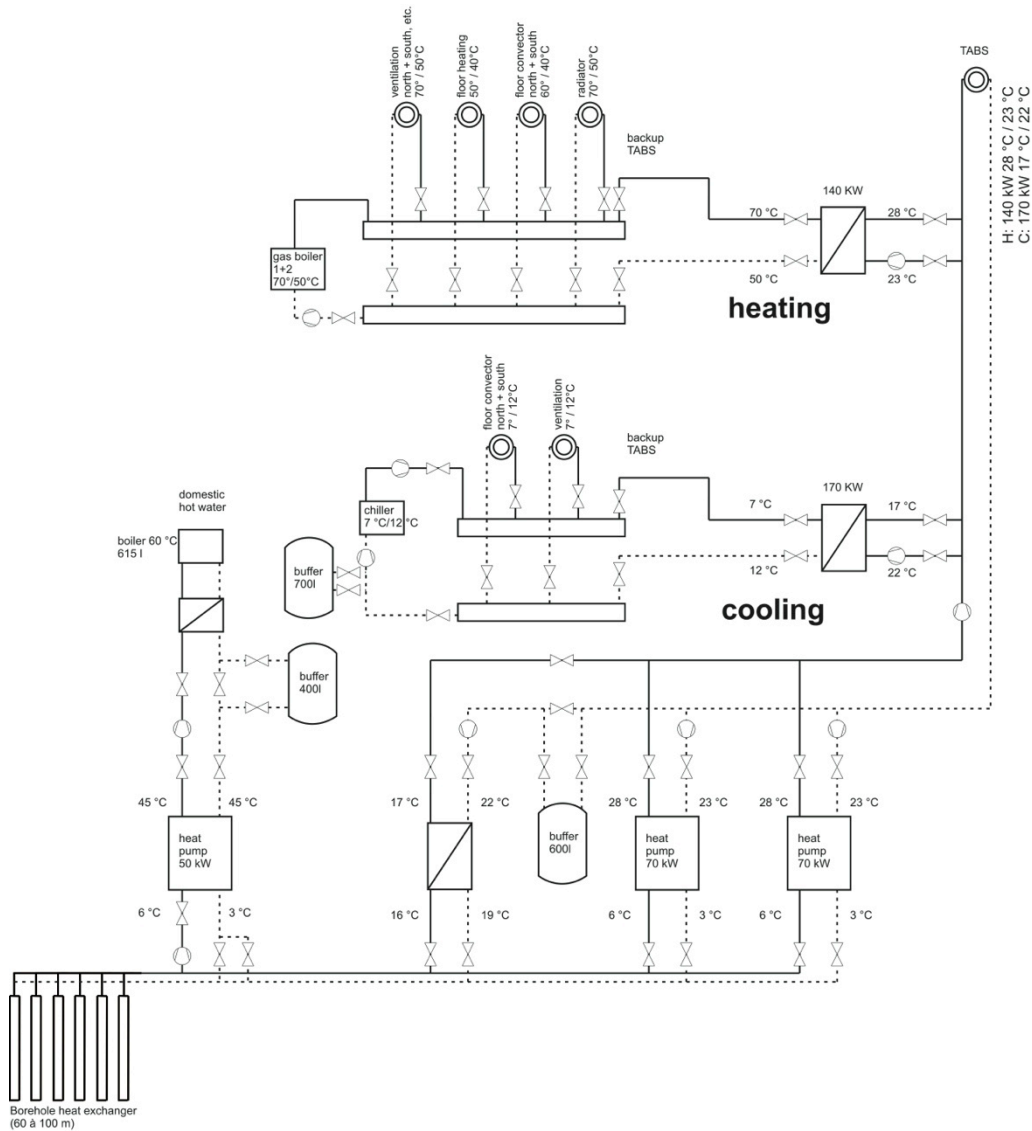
Hydraulic scheme of the HVAC plant of the building D
